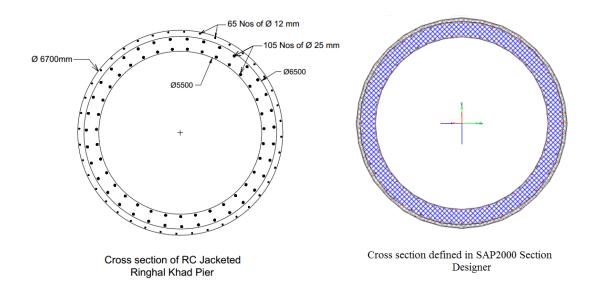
Cross section of the pier after the reinforced concrete jacketing
